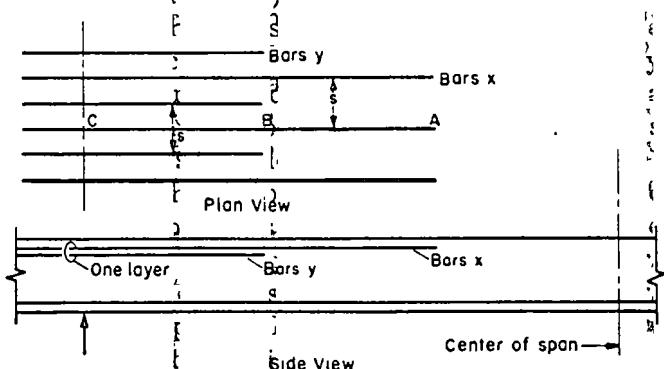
Sketch to clarify meaning of spacing in Section 12.5(d)
